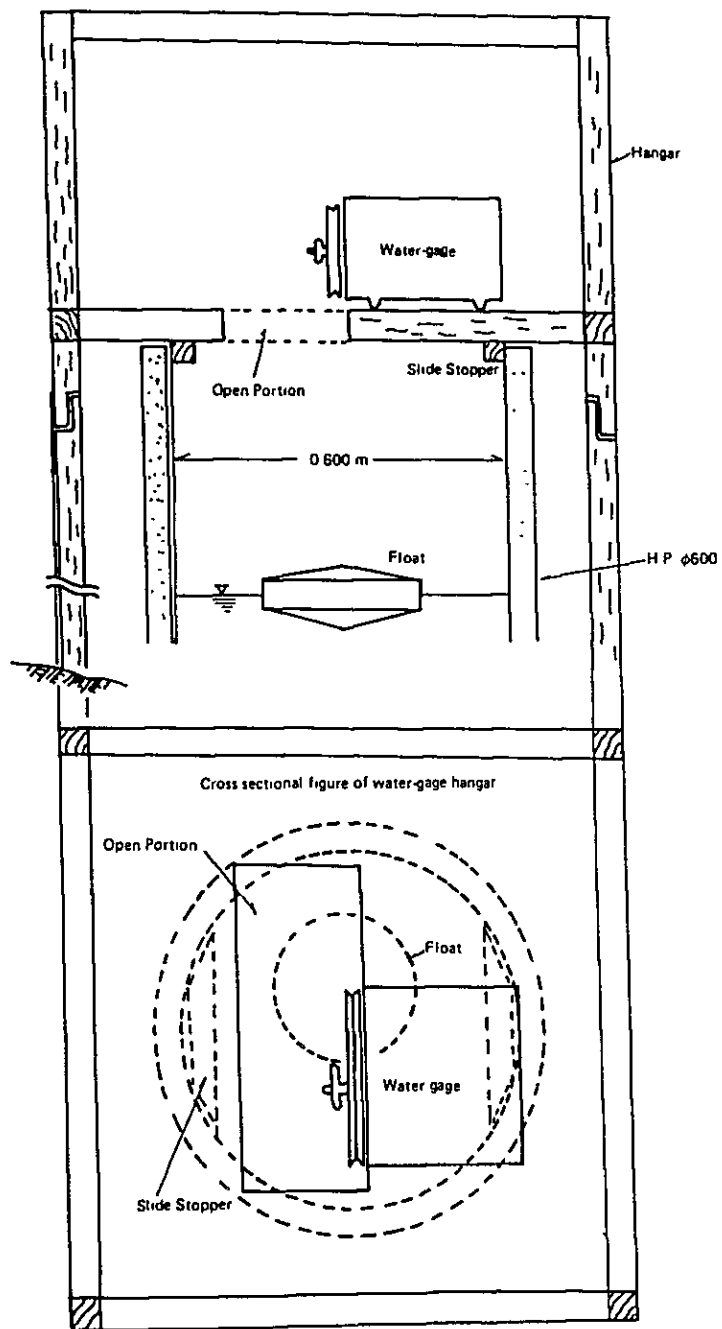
Detail Drawing of Water Gage Installation
